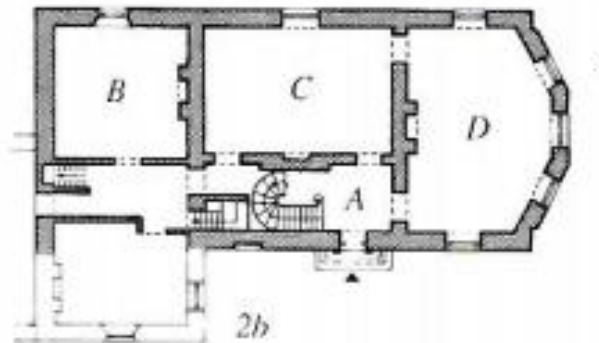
Plan of Nash house as built © Richard Suggett, RCAHMW (by kind permission of the author)
